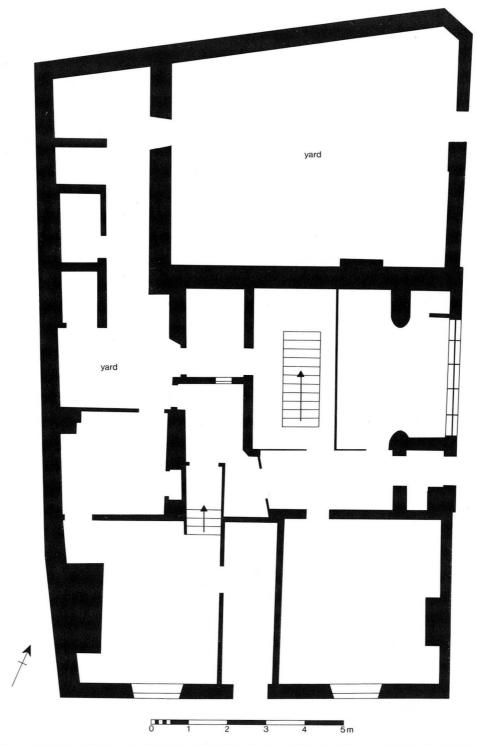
Period IV (east). Building 3132. Block plan (After A.P.Baggs, 1962). Scale 1:100.
